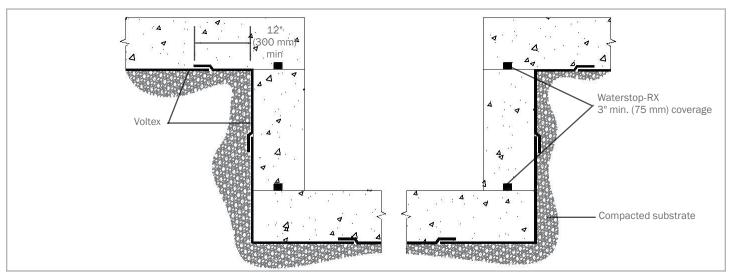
Voltex under elevator pit slab and on excavation cut walls
